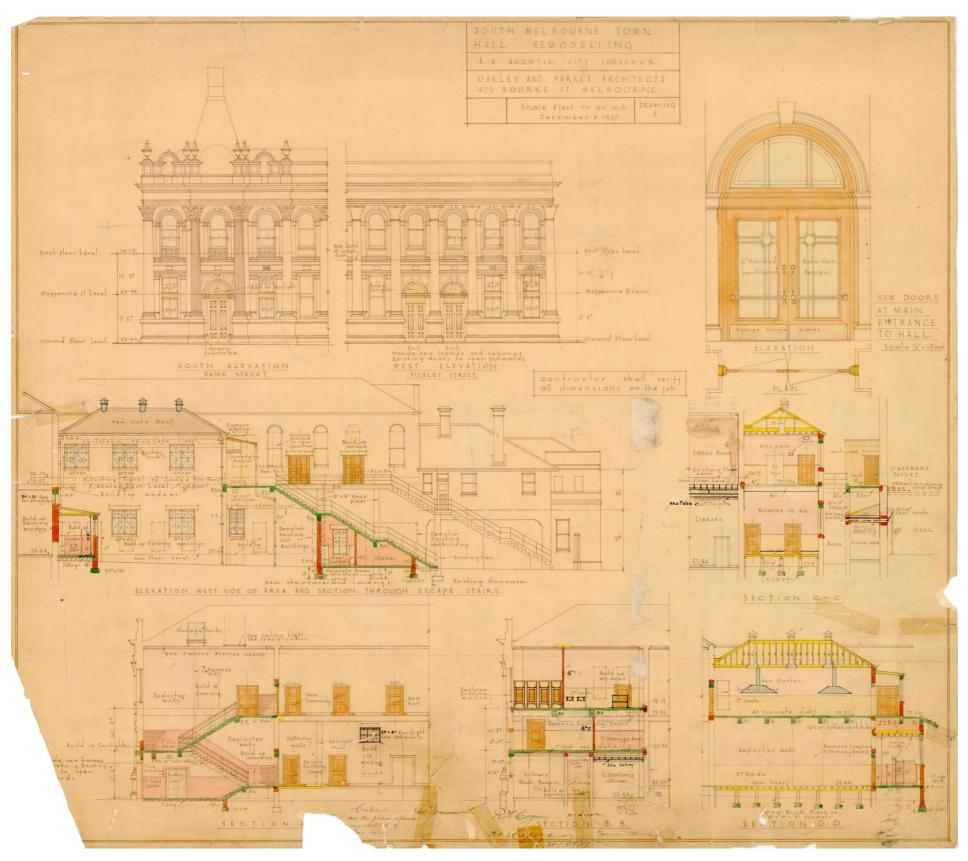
1937 Oakley & Parkes section and elevation drawings detailing various alterations to building access, amenities and kitchen facilities Source: City of Port Phillip
